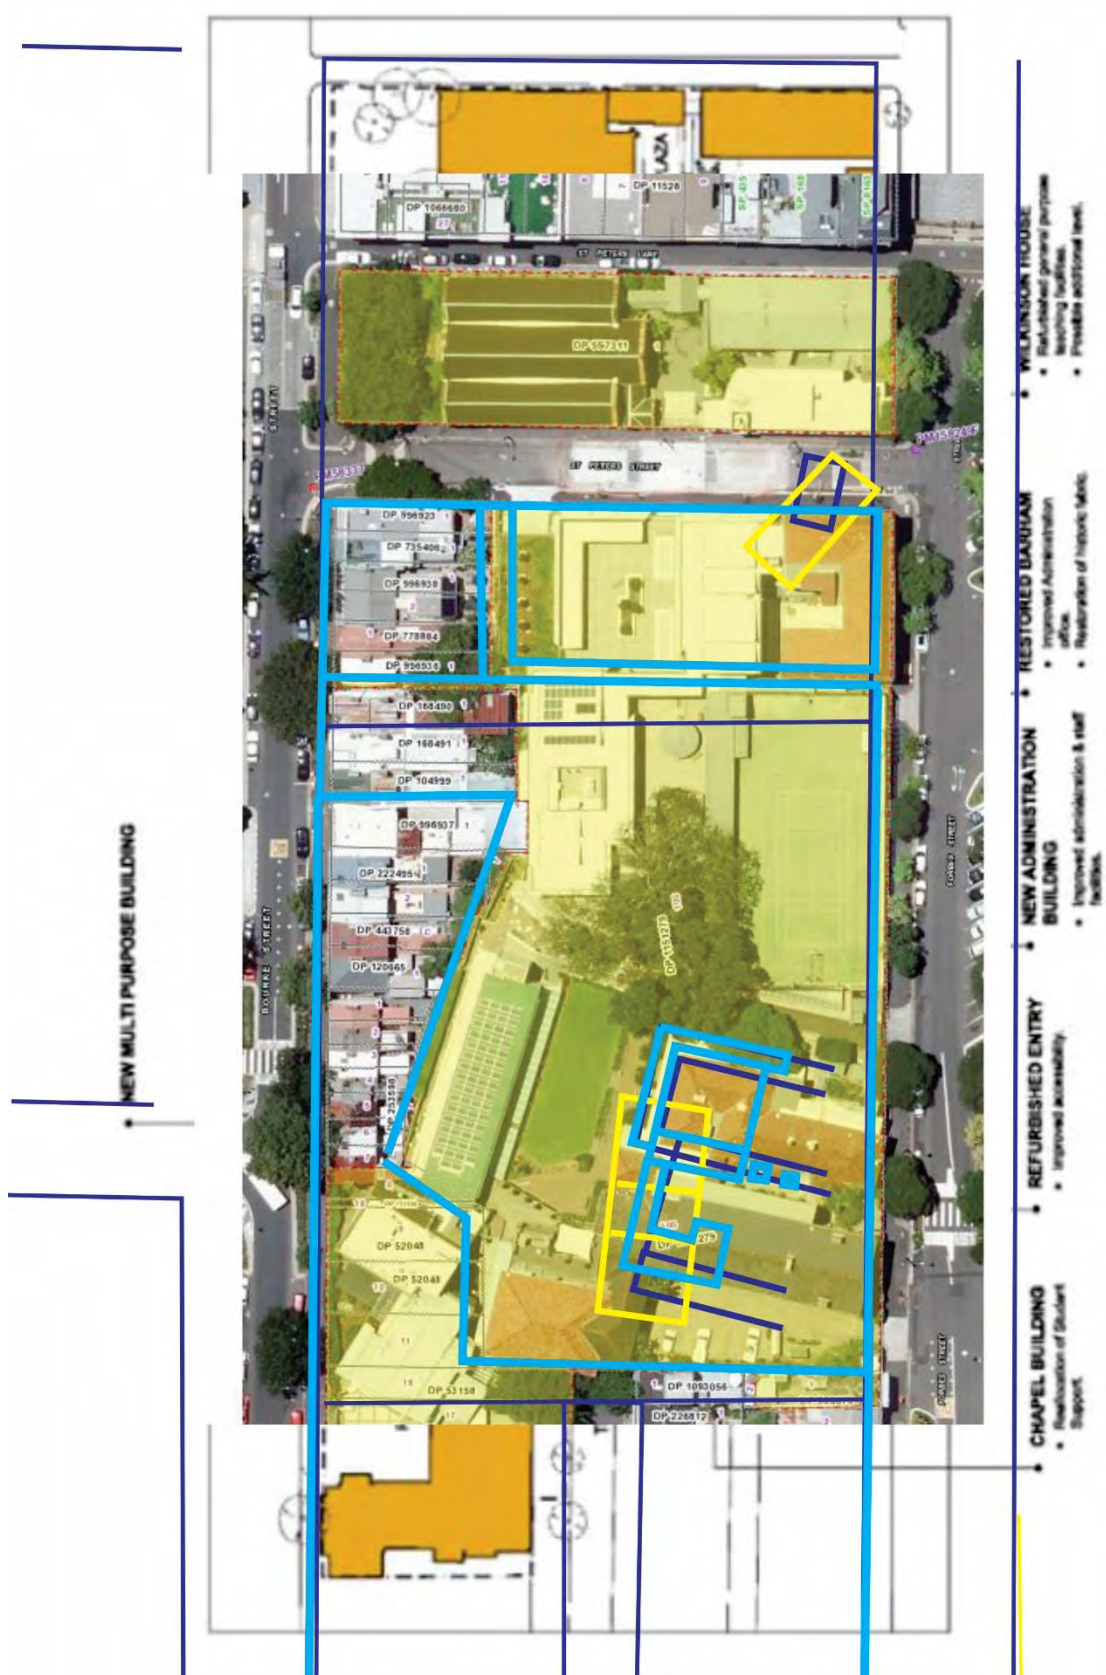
Overlay of Woolcott and Clarke's 1854 plan (yellow) and Dove's 1888 plan (blue). At least two outbuildings are shown to the east of Barham.
